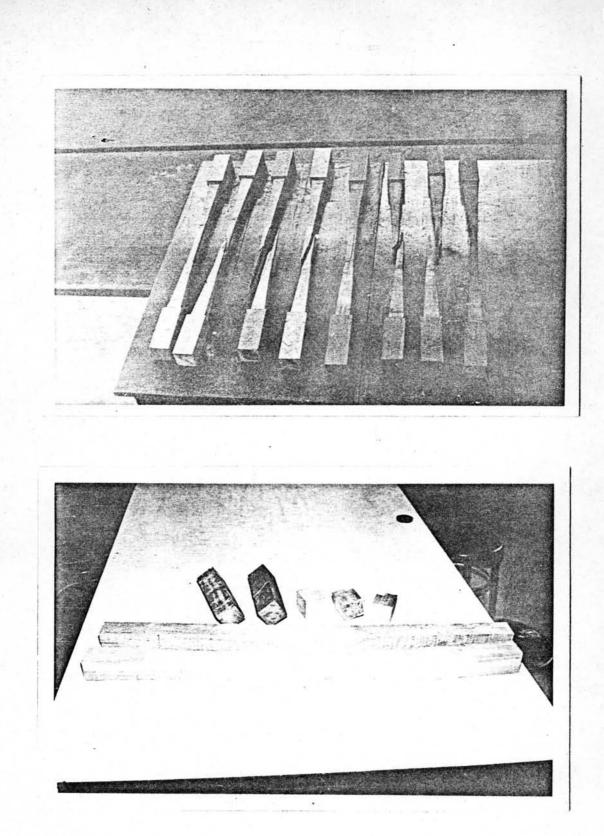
TYPICAL FAILURE OF SMALL SPECIMEN
